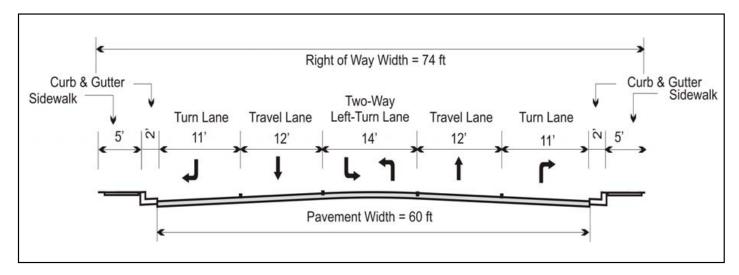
Three-lane Major Collector Street Cross-section, At Intersections
